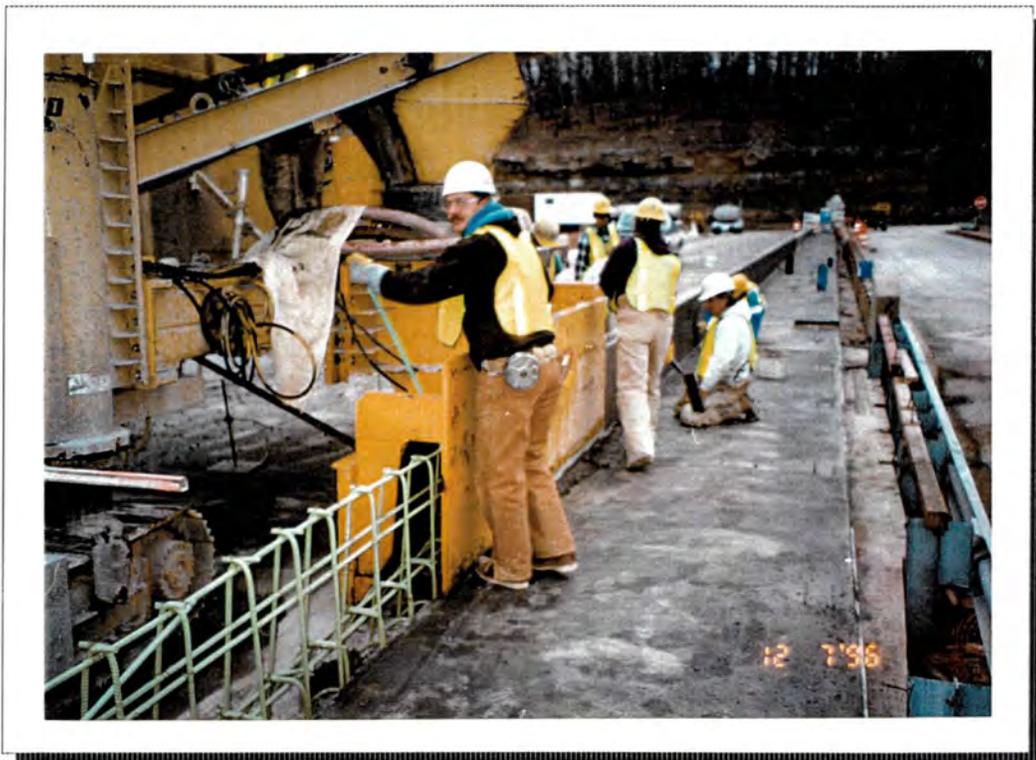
Sidewalk adjacent to barrier slip-formed on new Cragwald Road bridge.
